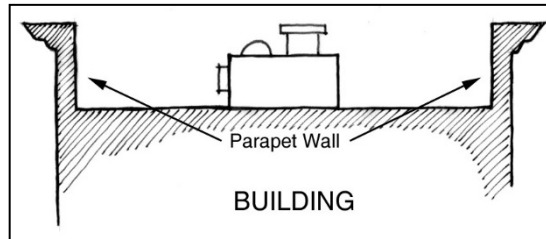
How Parapet Walls are Utilized to Screen Roof Mounted Mechanical Equipment.
